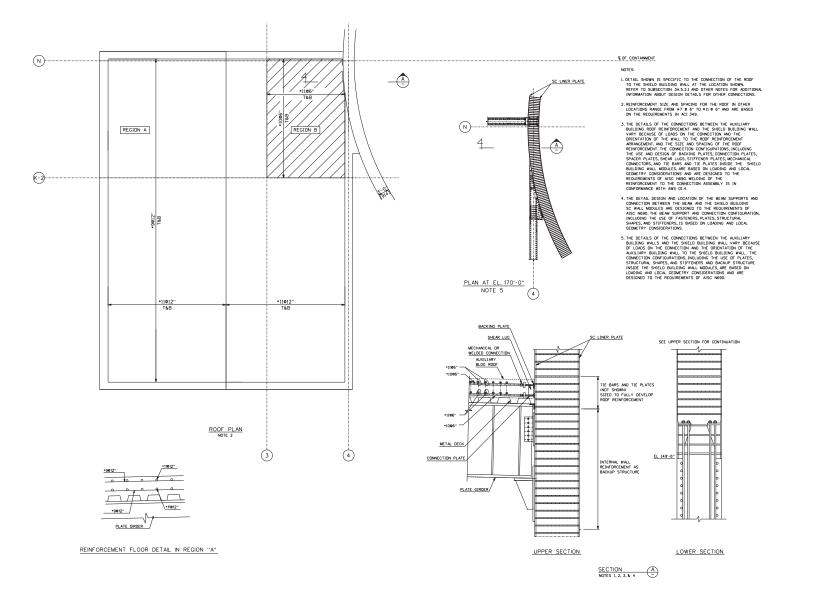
H.5-7 [Typical Reinforcement and Connection to Shield Building]
